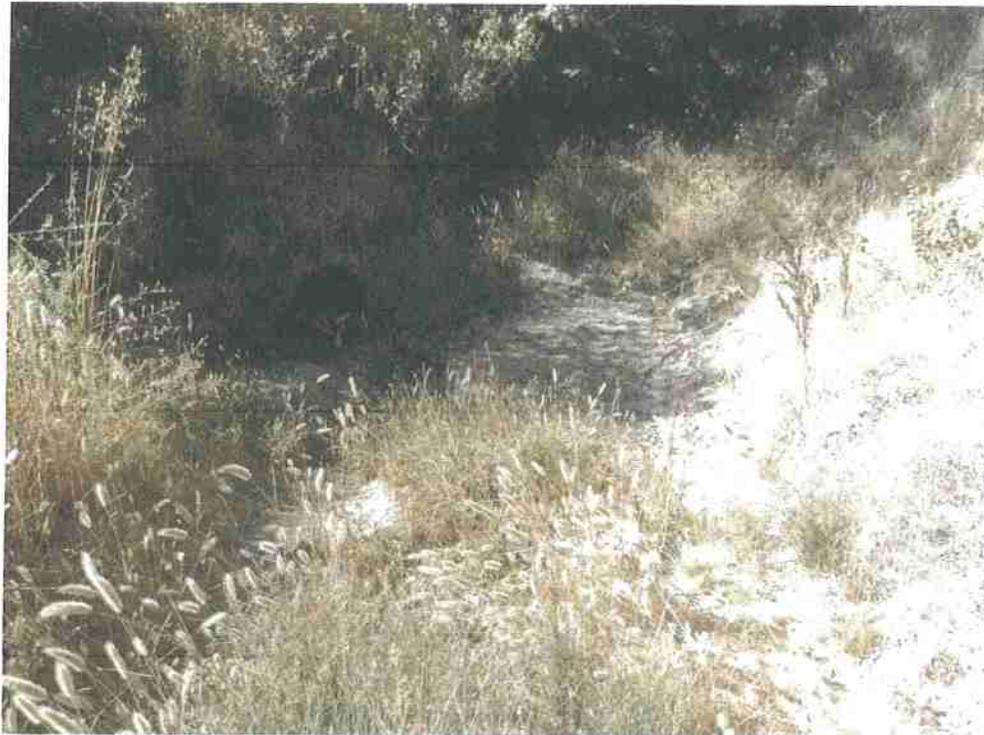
SC #1, MP #2 - View of sediment wedge deposited immediately upstream of culvert inlet, caused by culvert plugging and low gradient culvert.
